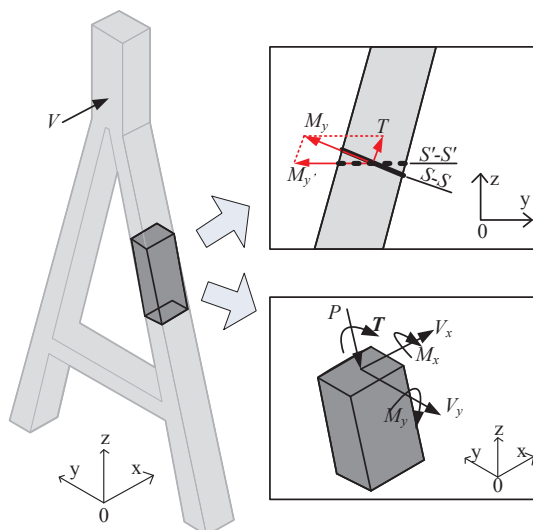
Load condition of inclined tower leg under longitudinal earthquakes.
